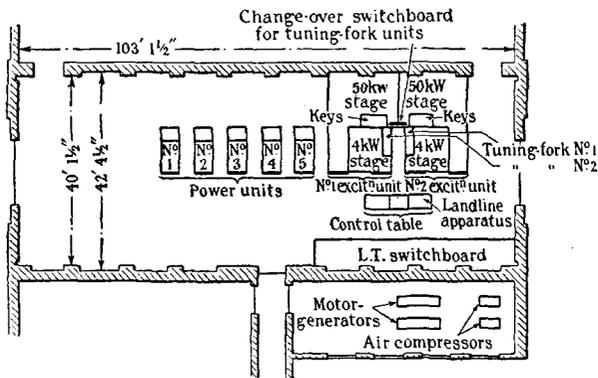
PLAN OF TRANSMITTING BUILDING.
